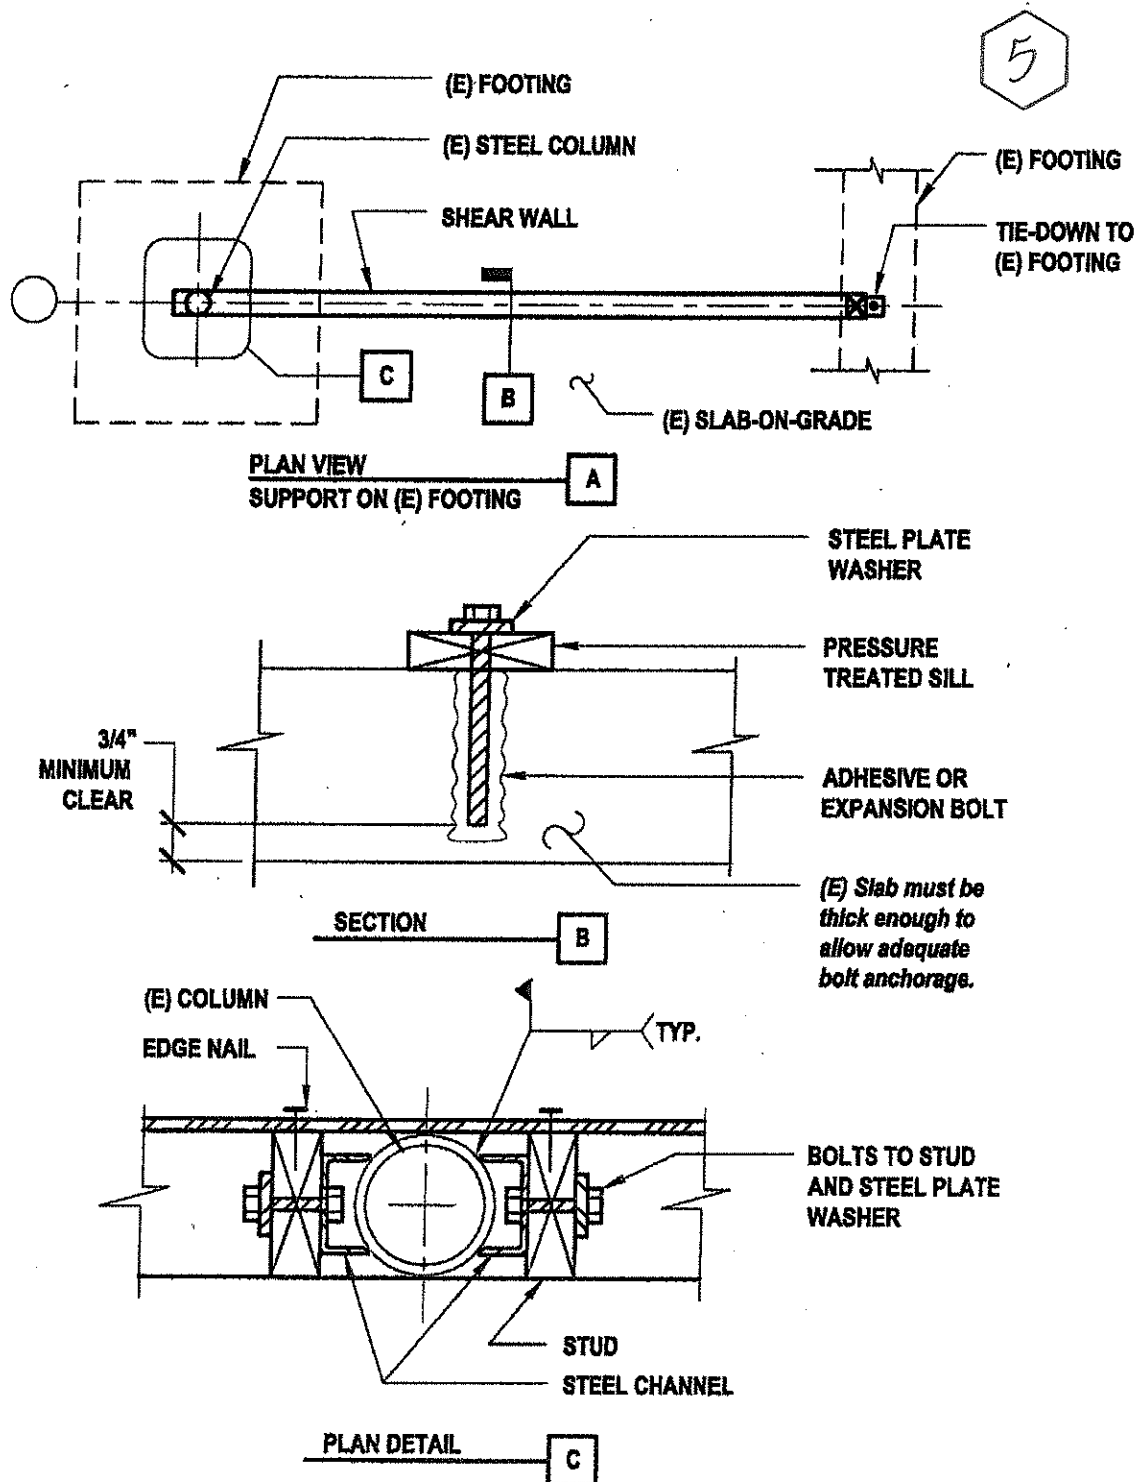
Added Shear Wall Supported on Existing Foundation and Slab
